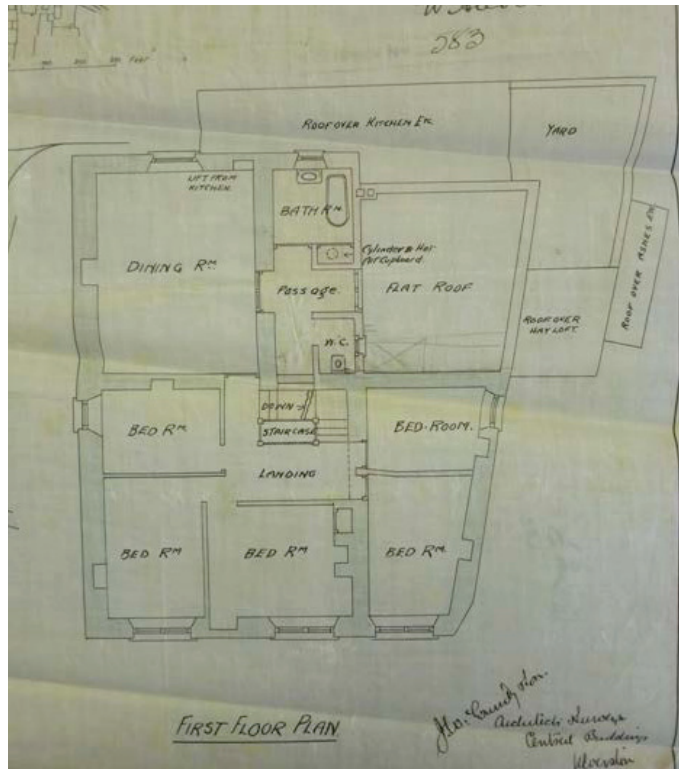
(right): Proposed first floor plan (CAC(B) BSRDNL/2/583 1909)
